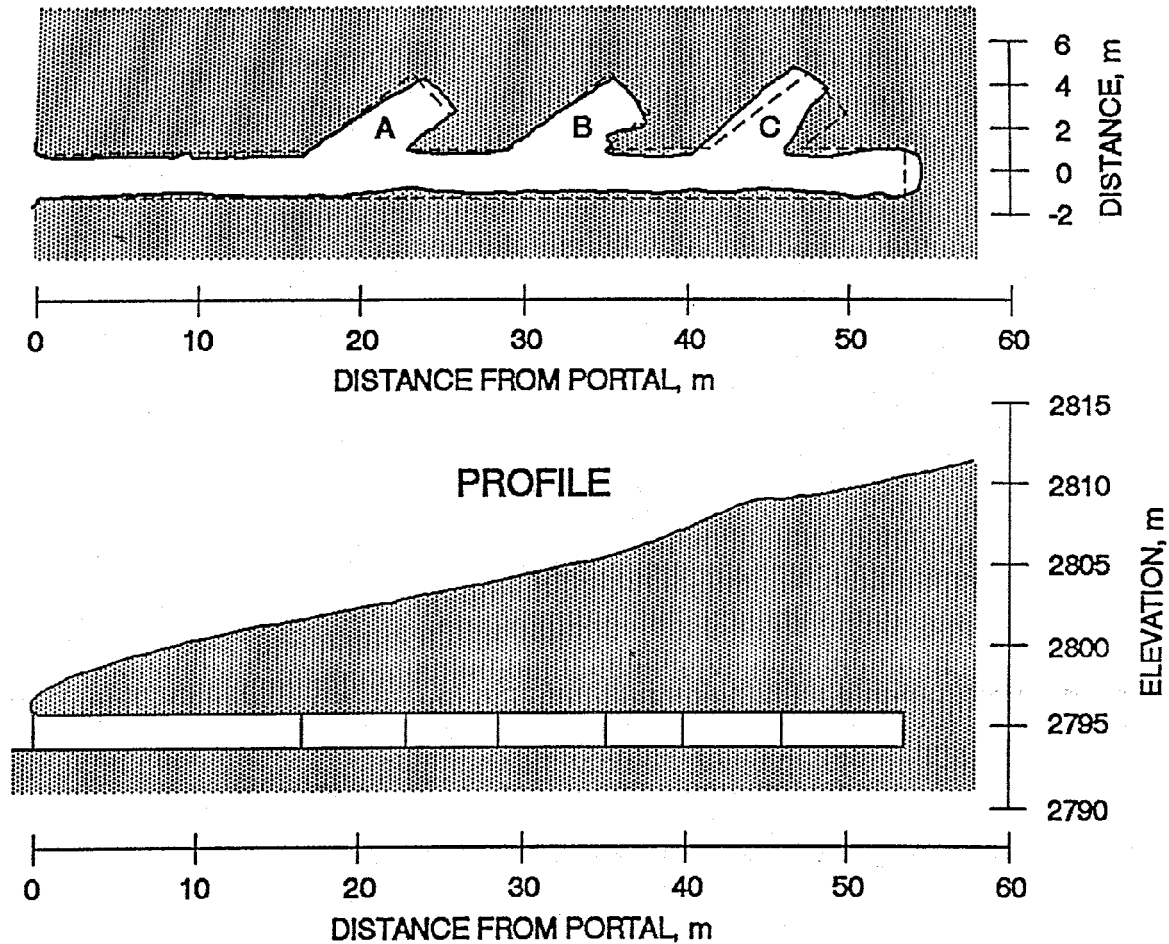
Longitudinal tunnel cross-section (plan and profile),
